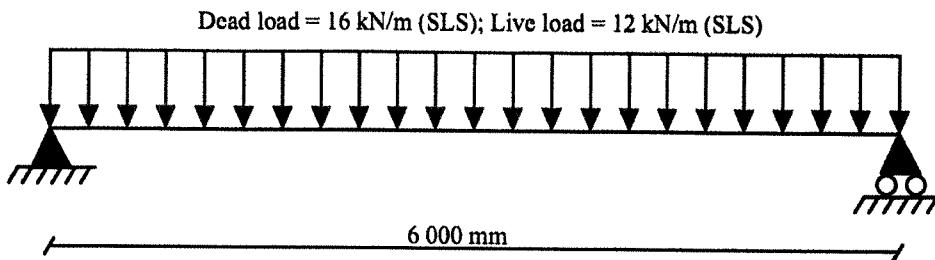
A loaded rectangular simply supported reinforced concrete beam
